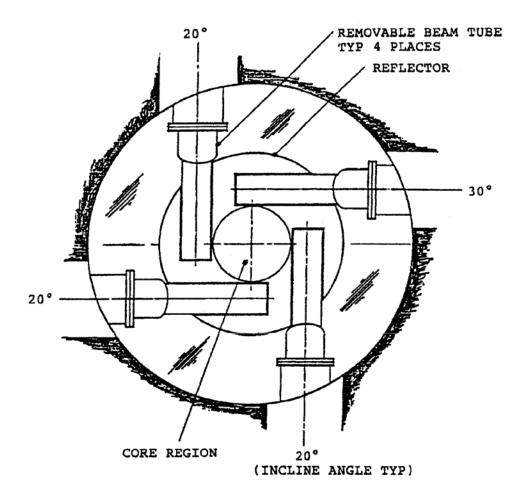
REACTOR AND BEAM TUBE ASSEMBLY
